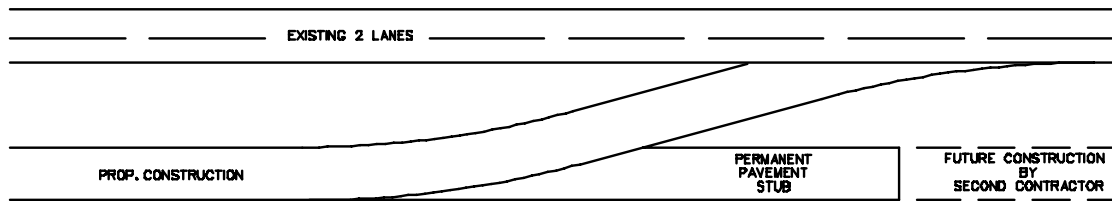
D – 7 SUGGESTED PAVEMENT STUBBING TREATMENT
